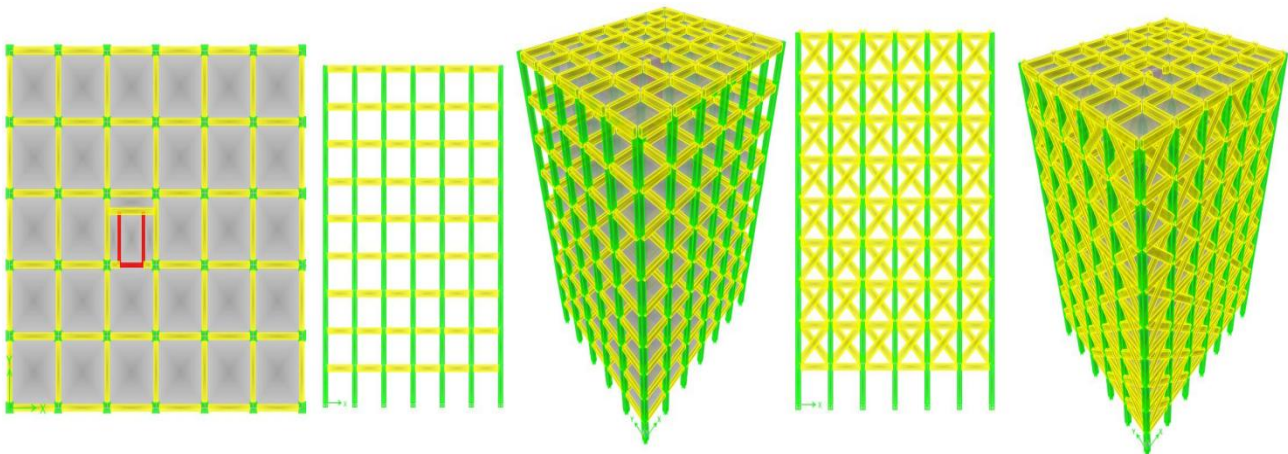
Plan, Elevation and 3D view of bare and infill frame for model-1 and model-2 respectively.
